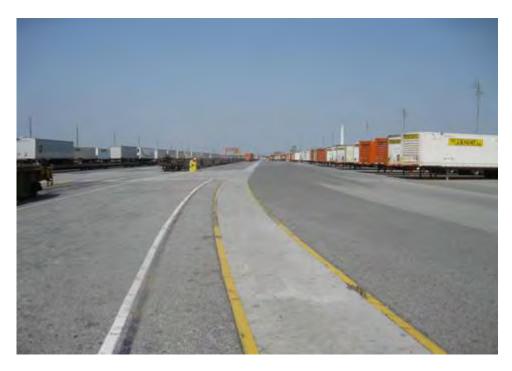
Proposed shoofly track area facing west from Mount Vernon Avenue Bridge.
